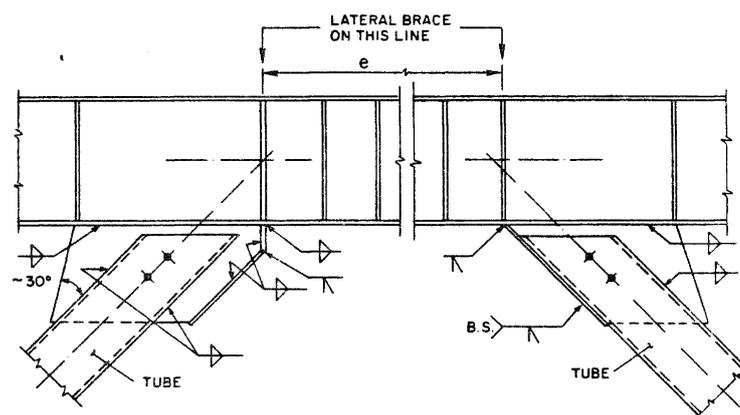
TYPICAL DETAILS OF TUBE BRACE AT LINK
